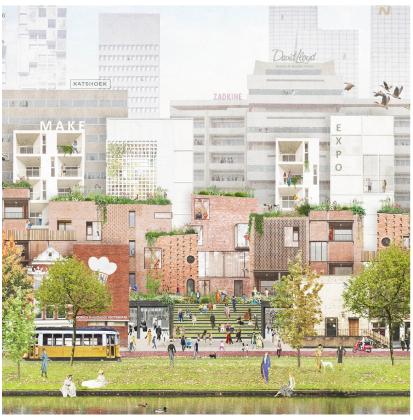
Conceptual collage of the proposed layers in the new plan; Labs on the ground floor, stone podiums and light towers (2019).
